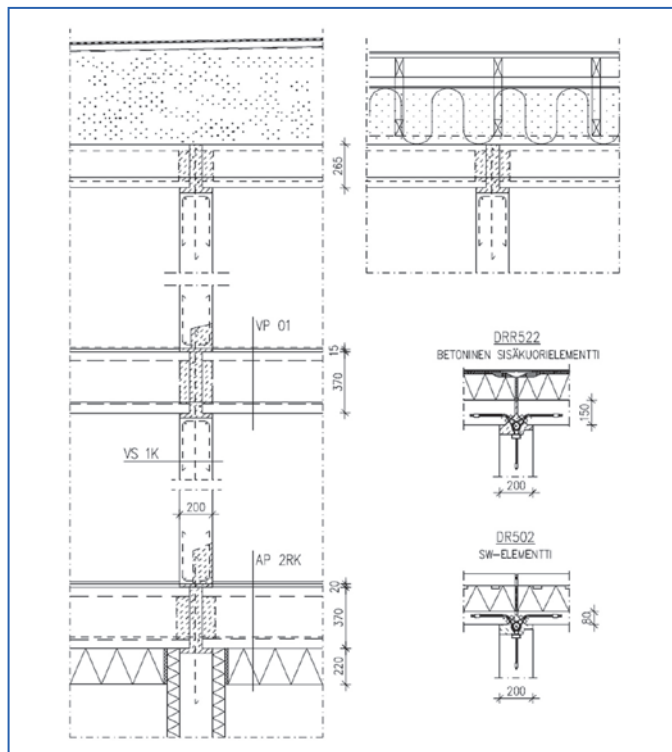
Structural system in apartments / flats with hollow-core slab as the floor structure [1].
